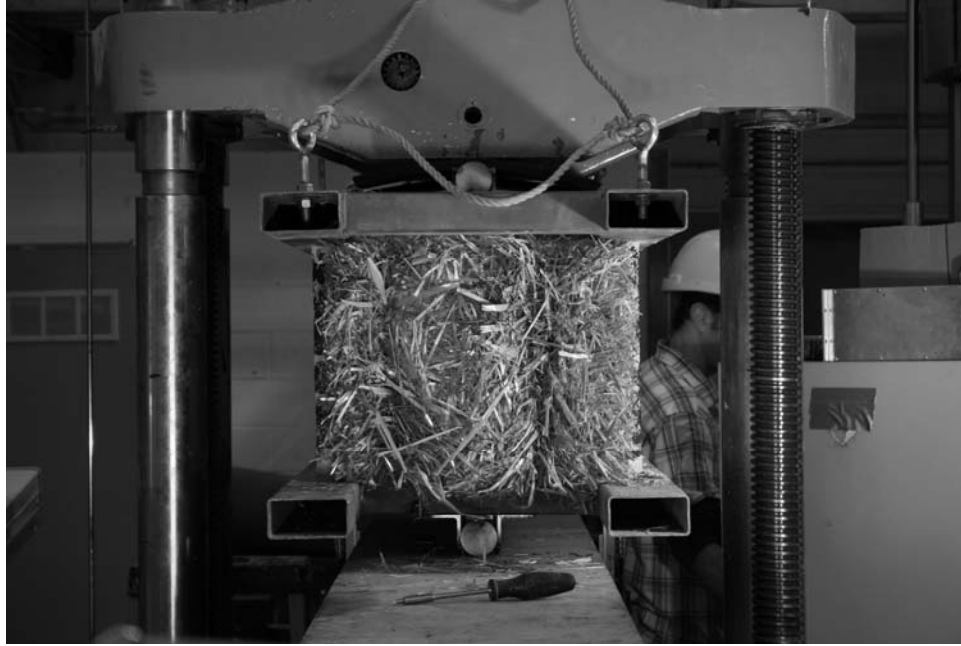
Concentric Loading of Specimen in Modified Jig
